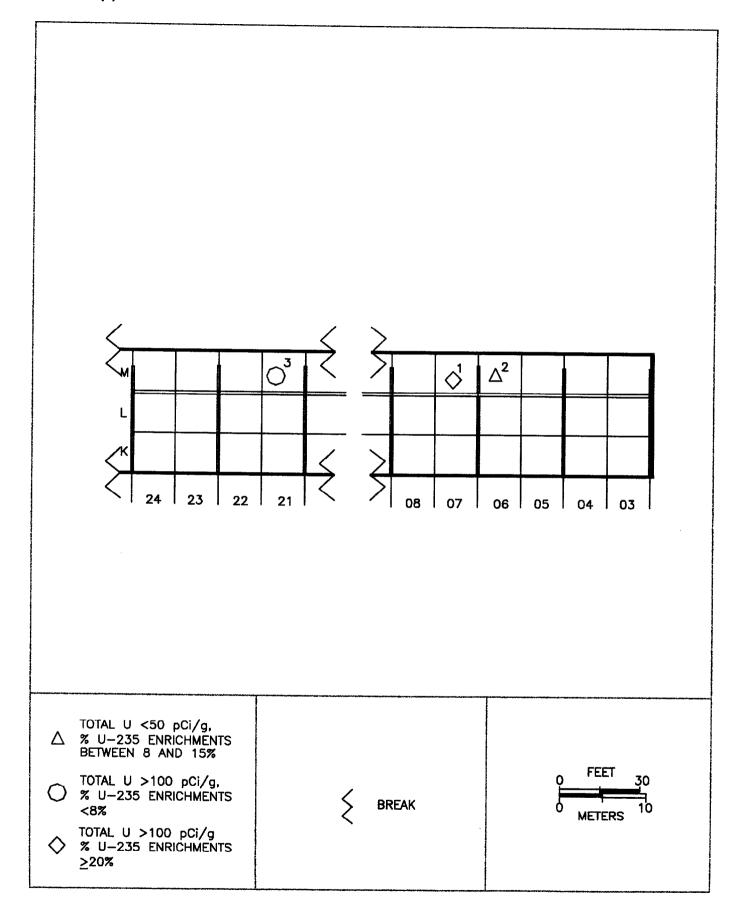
Building 3, West Wall Above Crane Rail — Measurement and Sampling Locations
